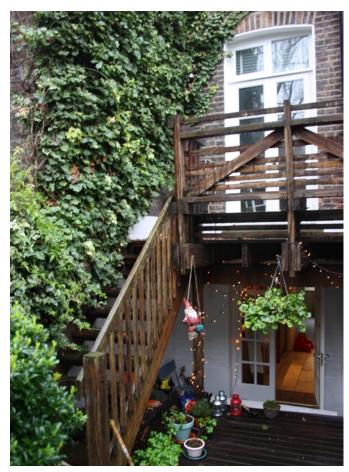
View of the existing balcony and stair, shading the rear opening at basement level, poorly detailed..
